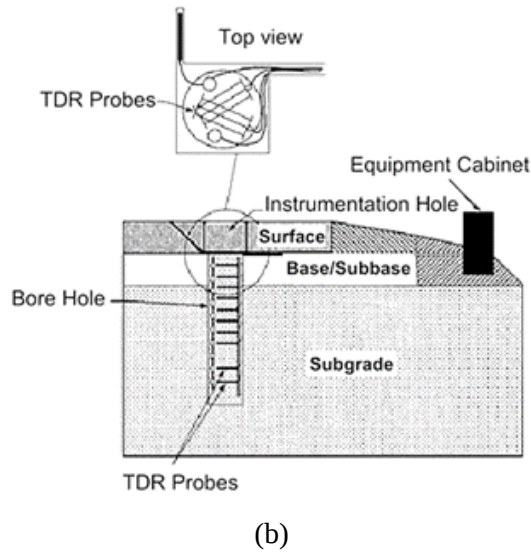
Summary of typical TDR sensor installation layout plan used in the LTPP and SMP (Zollinger, et al 2008; Rada, et al. 1995)
